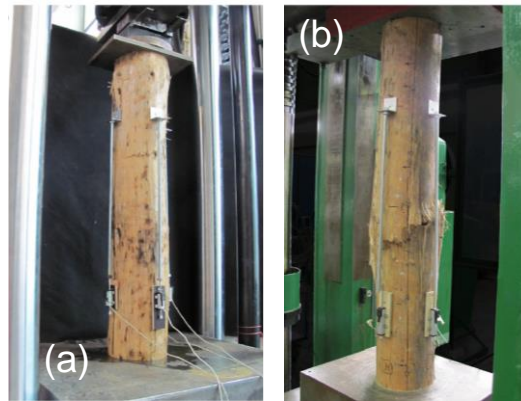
Full-scale compression tests on (a) saturated spruce pile; (b) dry spruce pile (Adaptation from [36]).
